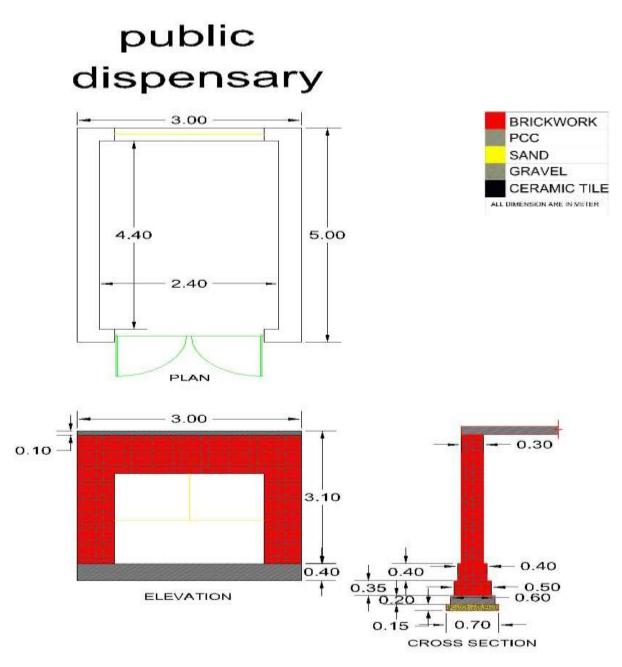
Plan, Elevation & Cross Section of Public Dispensary
